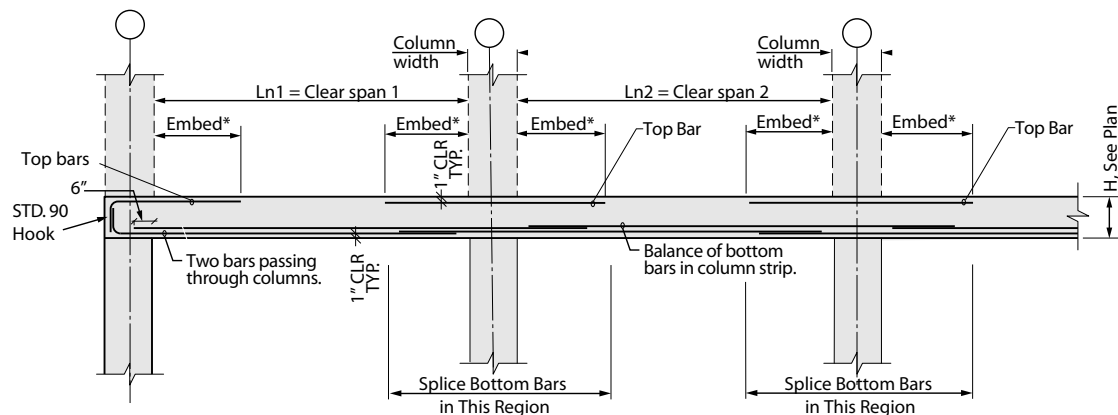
An example of a detail that should be provided by the designer to address reinforcing bar placement at slab-column connections.
